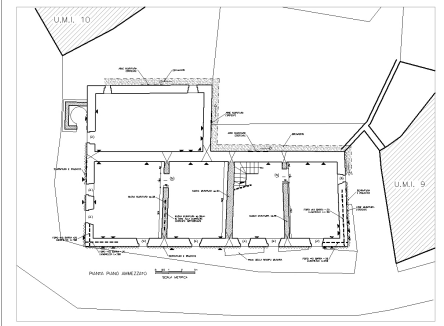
Typical floor plan illustrating the extent of stone masonry wall reconstruction.
